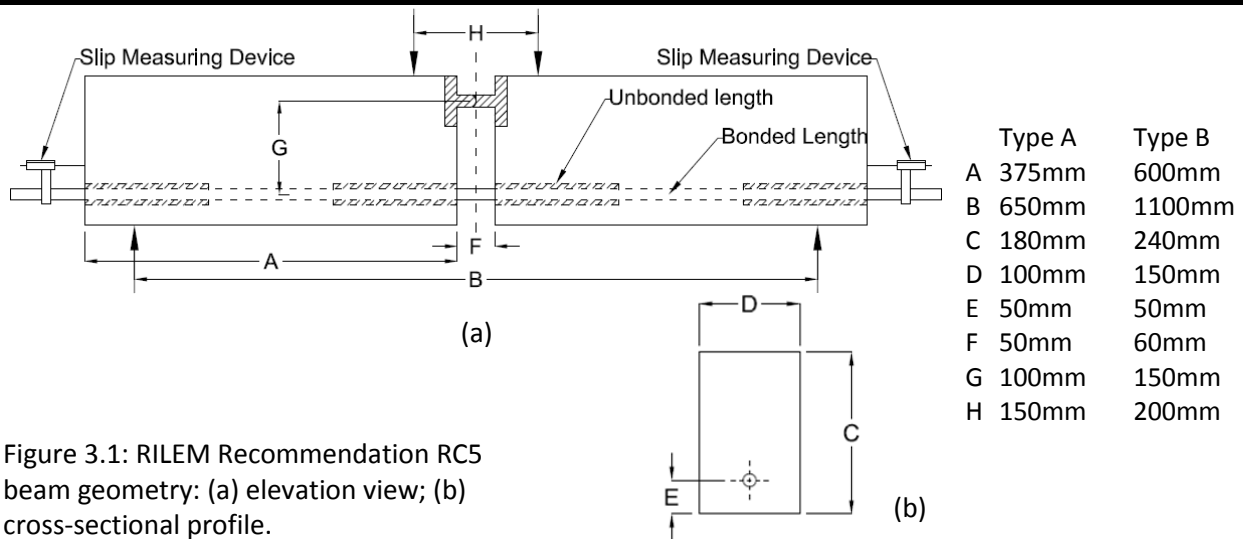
RILEM Recommendation RC5 beam geometry: (a) elevation view; (b) cross-sectional profile.
